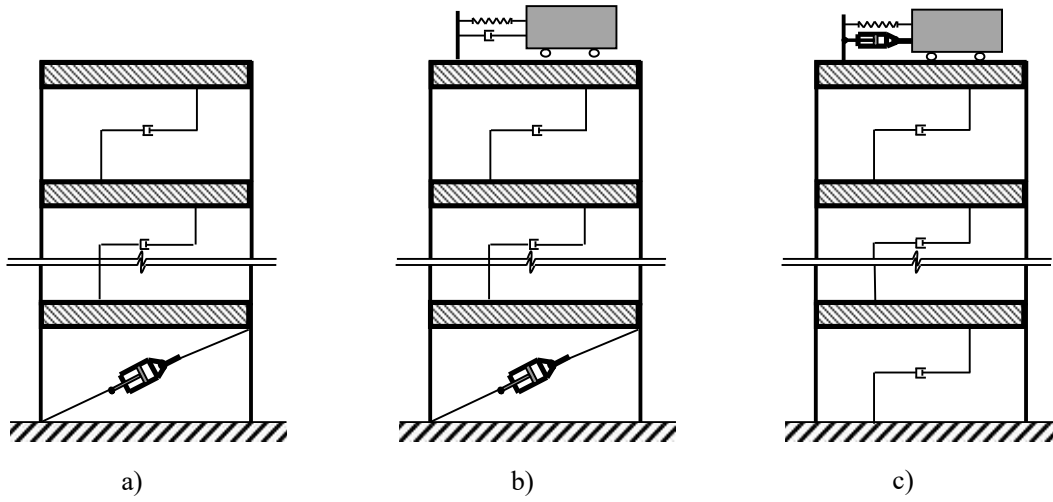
(a) Structure with MR damper at bottom floor (b) Structure with a TMD at top and MR damper at bottom floor (c) Structure with a conventional MR-STMD
